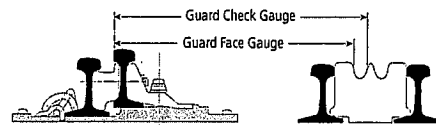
Guard Check Gauge and Guard Face Gauge Measurement Locations.
